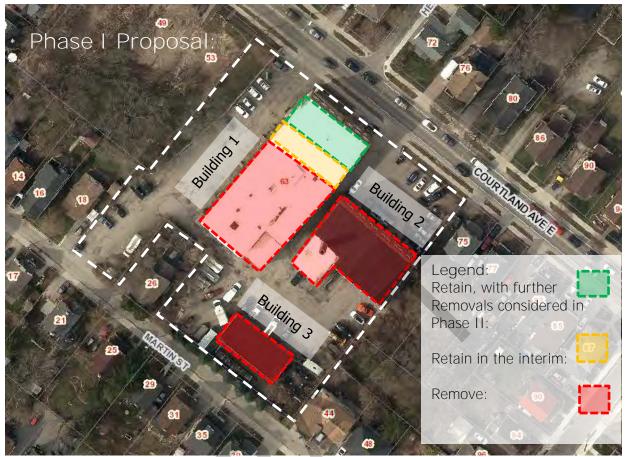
Aerial photo noting the location of the subject property at 63 Courtland Avenue East, outlined in white. Location of building fabric proposed for demolition noted in red (demolish) and retention noted in green (retain in Phase I). Portion of the building to be retained in the interim and demolished at a later date noted in orange. (Source Kitchener Interactive map, accessed 2024)
